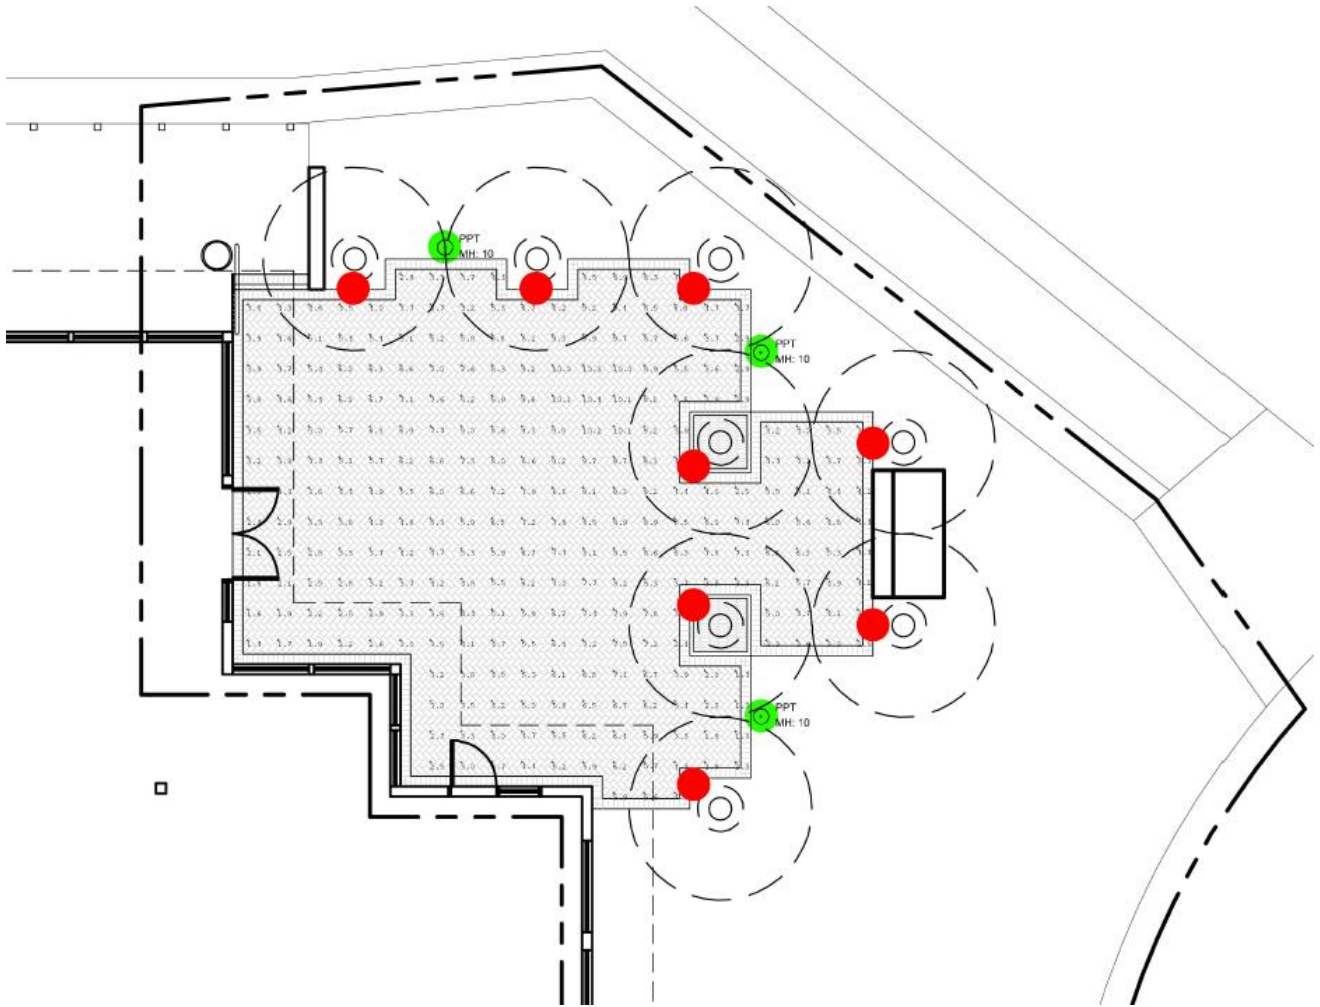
A-B: Electrical Fixture Plan + Proposed Light Fixtures, as provided by applicant.
